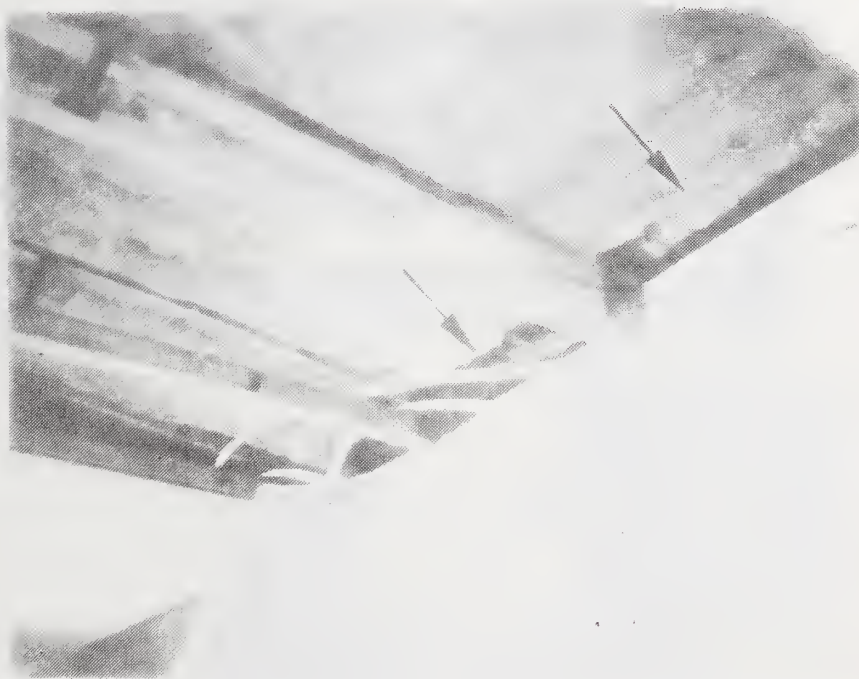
Insulation Cut Short at Juncture of Roof Truss and Exterior Wall
